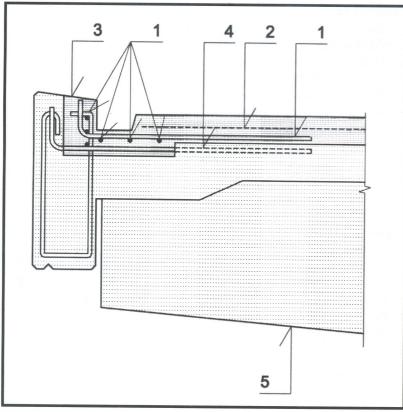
Perimeter Beam And Plank With Surface Scupper Drain
